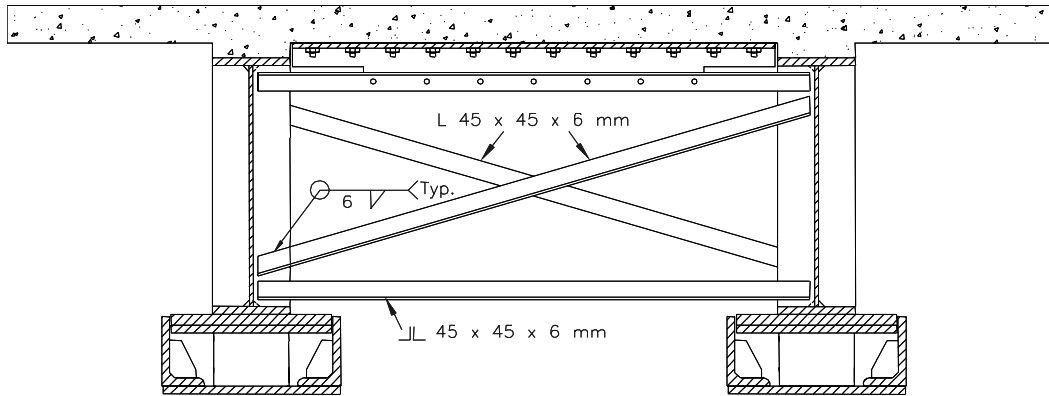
“Heavy” end cross frames in the bridge model with welded connections
